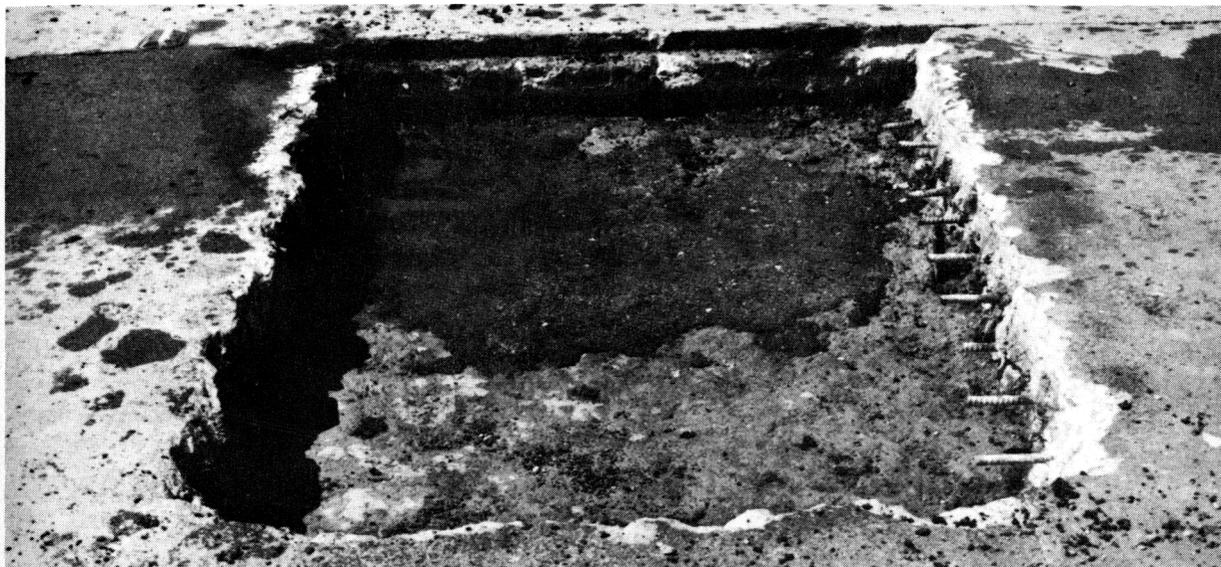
PATCH #1 BEFORE BEING FILLED WITH FIBERGLAS REINFORCED CONCRETE
